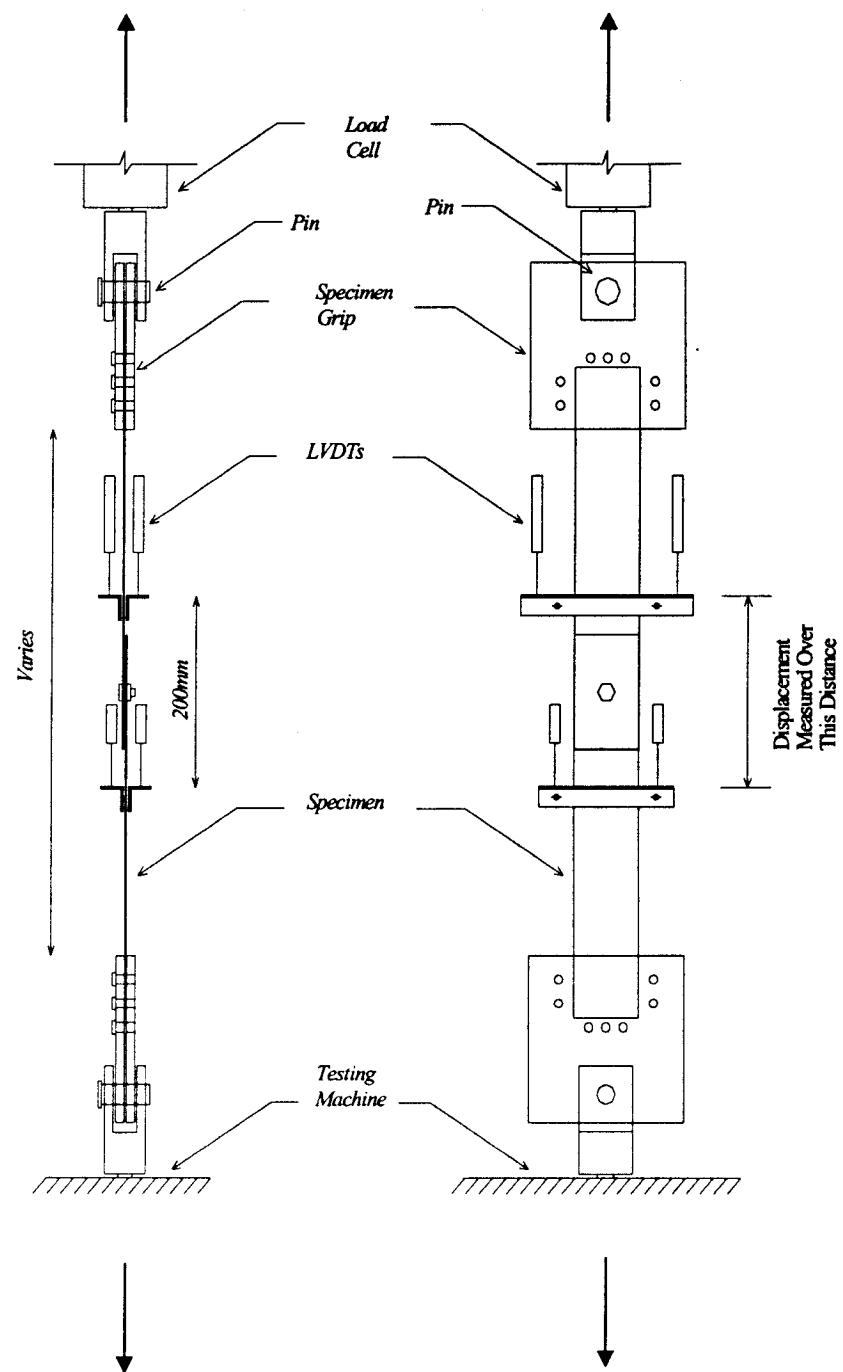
Schematic Drawing of Bolted Connection Set-Up
